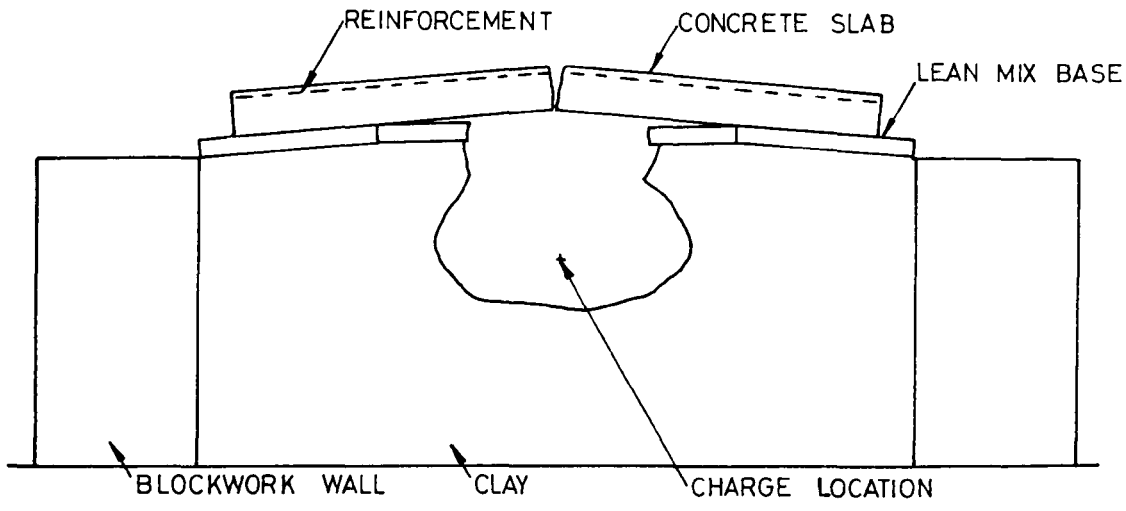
CRATER FORMED IN CLAY UNDER A REINFORCED CONCRETE SLAB BY A 16g EXPLOSIVE CHARGE (SUBSURFACE)
